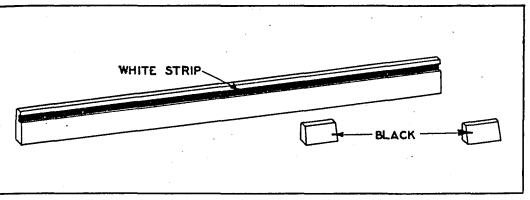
STANDARD SIGHTING BOARD AND BLOCKS.
